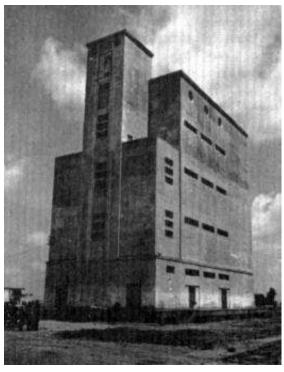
The five-story silo building of reinforced concrete construction. The structures with reinforced concrete walls withstood the earthquake forces (Minami, 1965).
